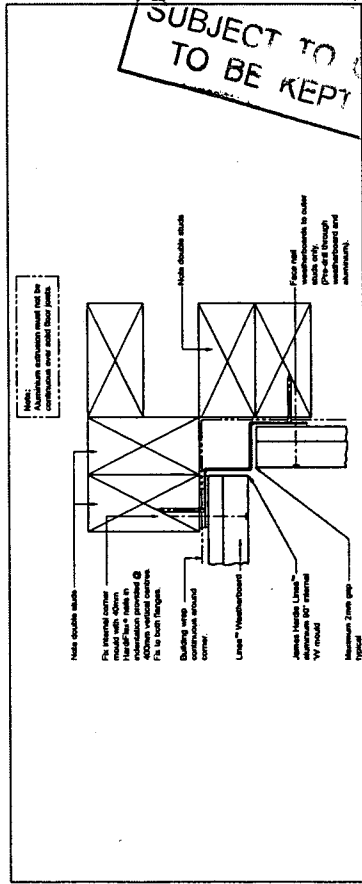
DIRECT FIX INTERNAL 90° ALUMINIUM 'W' MOULD CORNER
